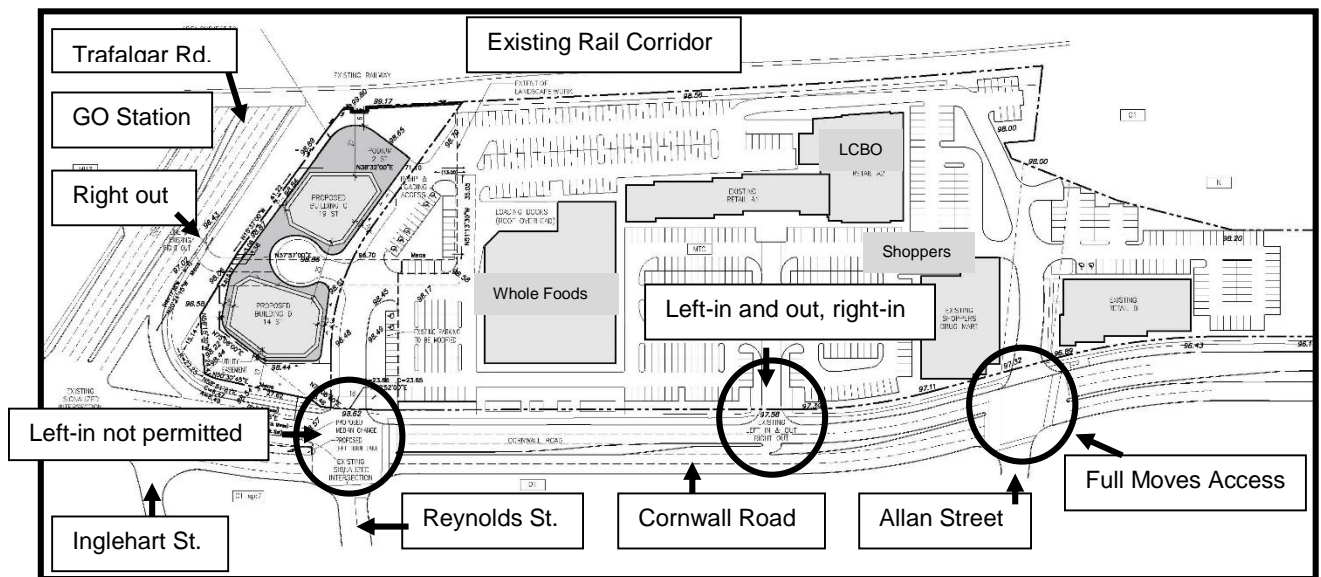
Overall Site Plan identifying all of the existing ingress and egress points for the site
